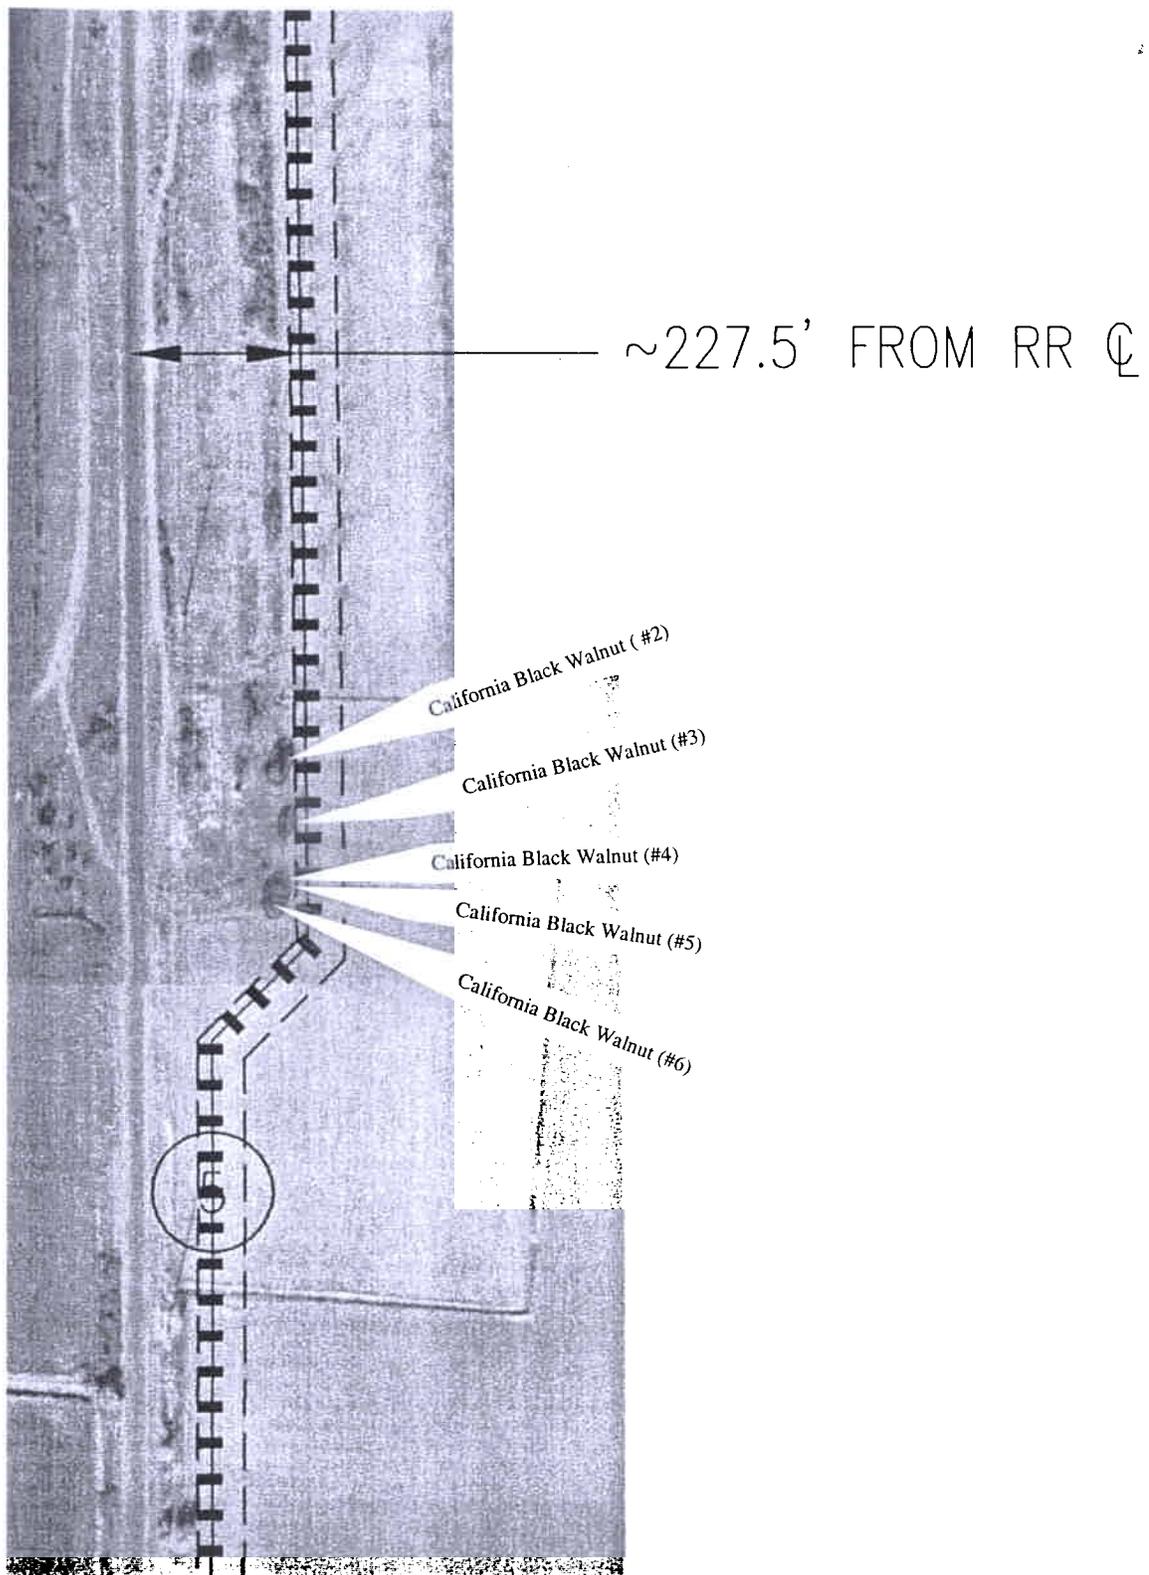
Location of California Black Walnut trees (#2- #6). Just south of Bilby Road, immediately west of the construction corridor.
